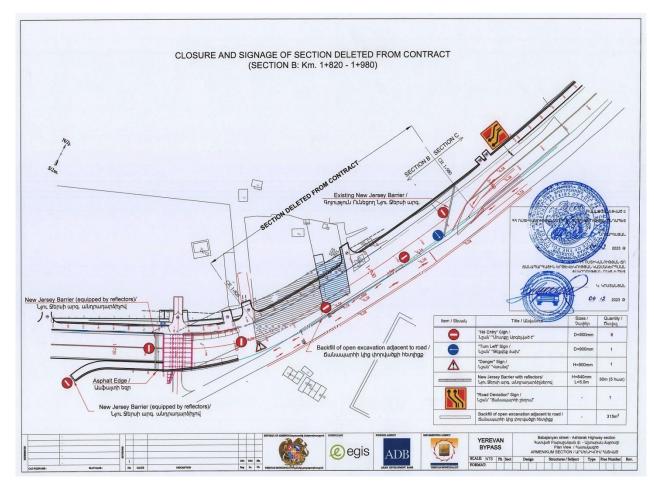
Layout Drawing "Plan View - Armenikum Section"
